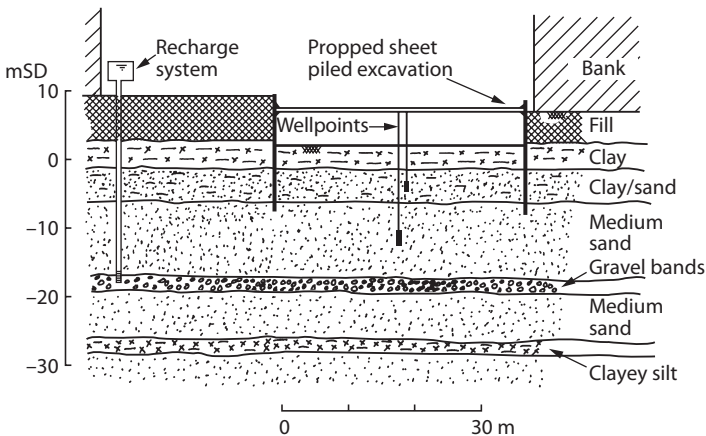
Bank Misr, Cairo—section through dewatering and recharge system. (Based on Troughton, V.M., *Groundwater Effects in Geotechnical Engineering*, Hanrahan, E.T., Orr, T.L.L., and Widdis, T.F., eds., Balkema, Rotterdam, 1987, pp. 259–264.)
